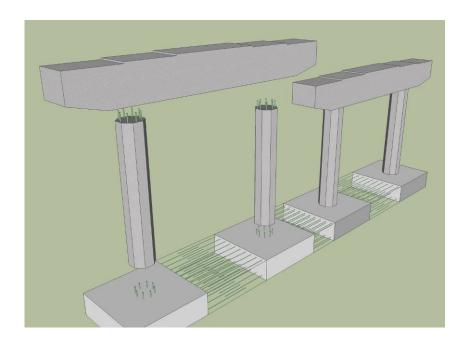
Prefabricated Open Frame Pier Bent
